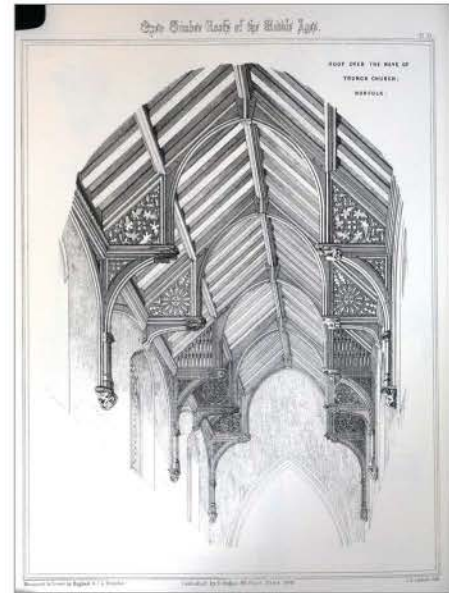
ROOF OVER THE NAVE OF TRUNCH CHURCH, NORFOLK (UK). | ILLUSTRATED IN BRANDON AND BRANDON, 1847. *OPEN TIMBER ROOFS*. SPECIAL THANKS TO MALCOLM THURLBY.
